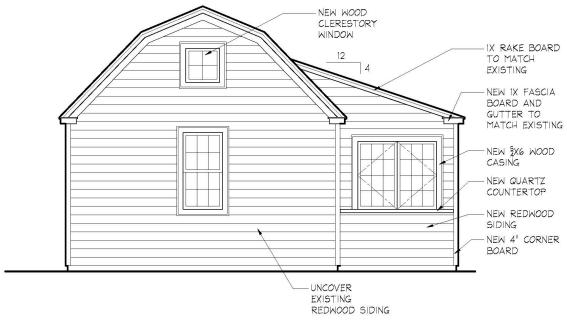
The proposed right side elevation proposes a new window in the gable end, an addition with a pair of windows, removal of the vinyl siding, and restoration and installation of redwood siding.
